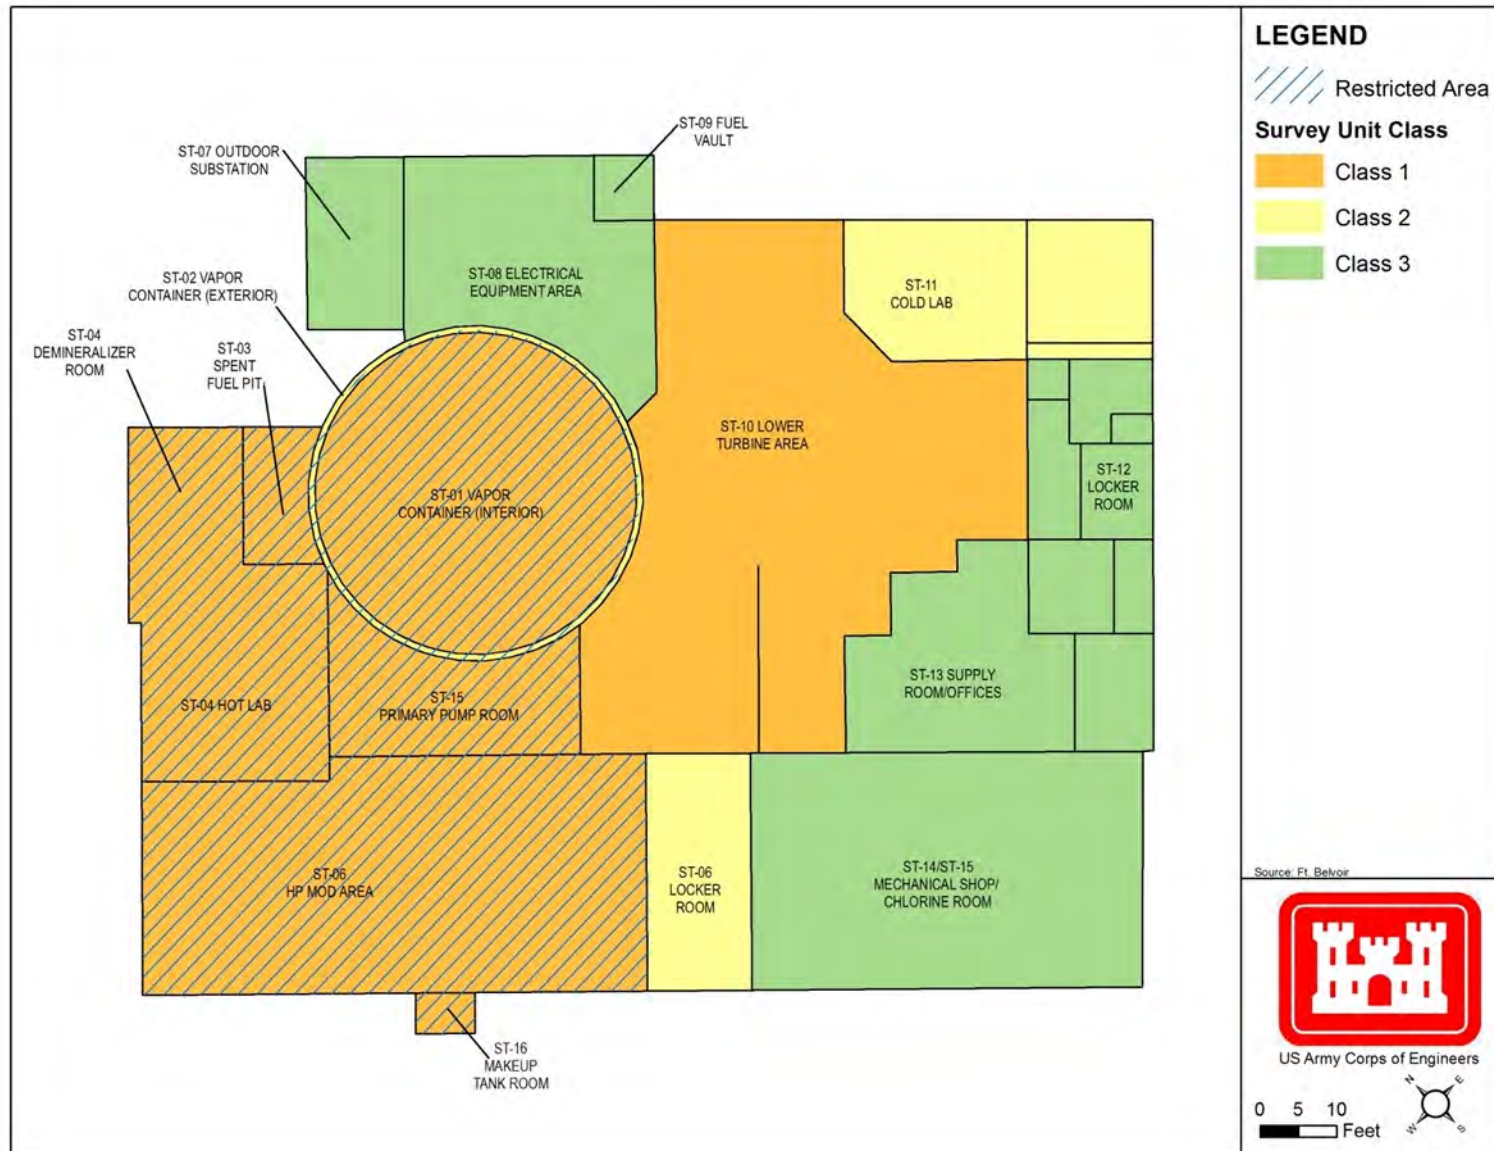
Categorization of Spaces in Building 372 - Upper Floor
